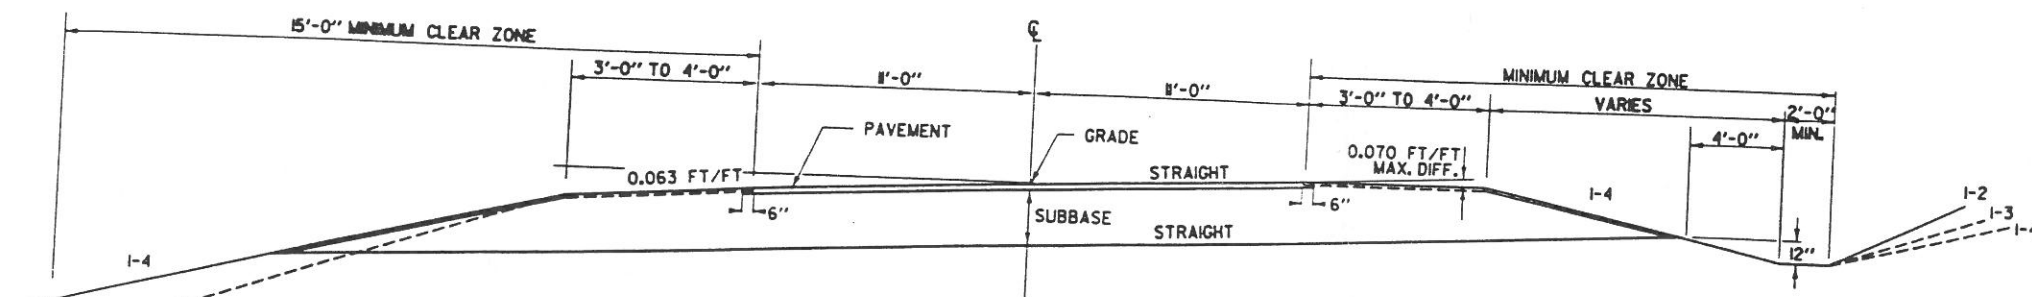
DETAILS OF DITCH AND BACKSLOPE FOR LOW SIDE OF BANK >= 0.042 FT/FT
